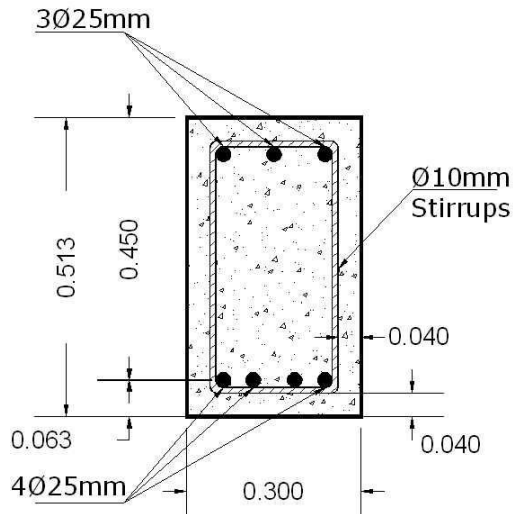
Cross section for beam of Example 4.6-1.
